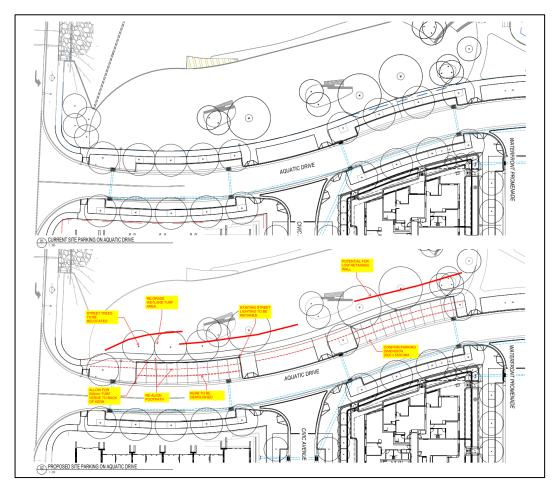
A sketch plan provided by the applicant demonstrating the current on-street parking on Aquatic Drive (top), and the proposed on-street parking configuration for Aquatic Drive (bottom).
